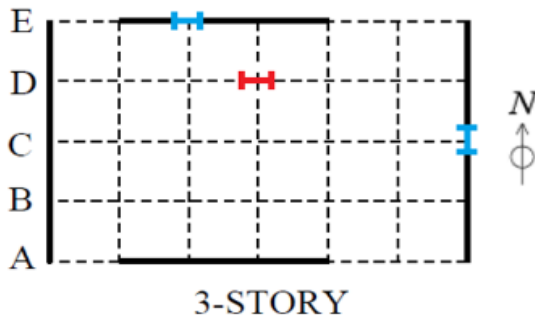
Floor Plan Layout of Moment Resisting Frames for BO Model Building
